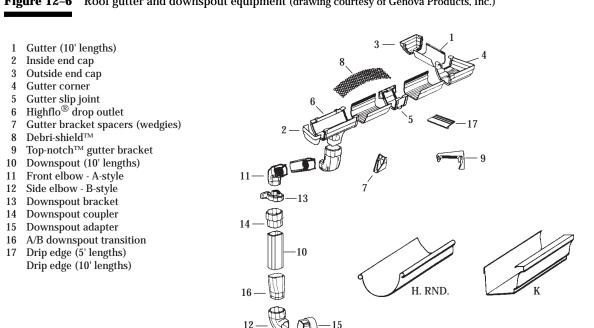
Roof gutter and downspout equipment (drawing courtesy of Genova Products, Inc.)
